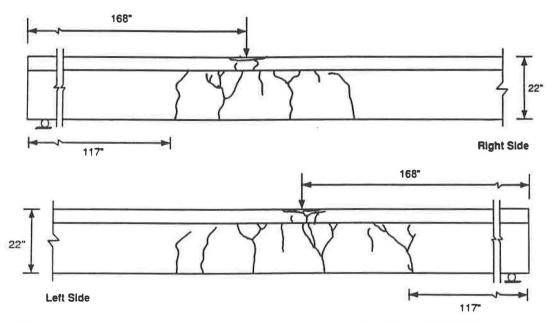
Crack Diagrams for Test 14. (Beam 12, End A, 2.0 Inch Strand Spacing, Pour 5 - Normal Strength Mix, Unconfined, 168 Inch Embedment Length, Flexural Failure.)
